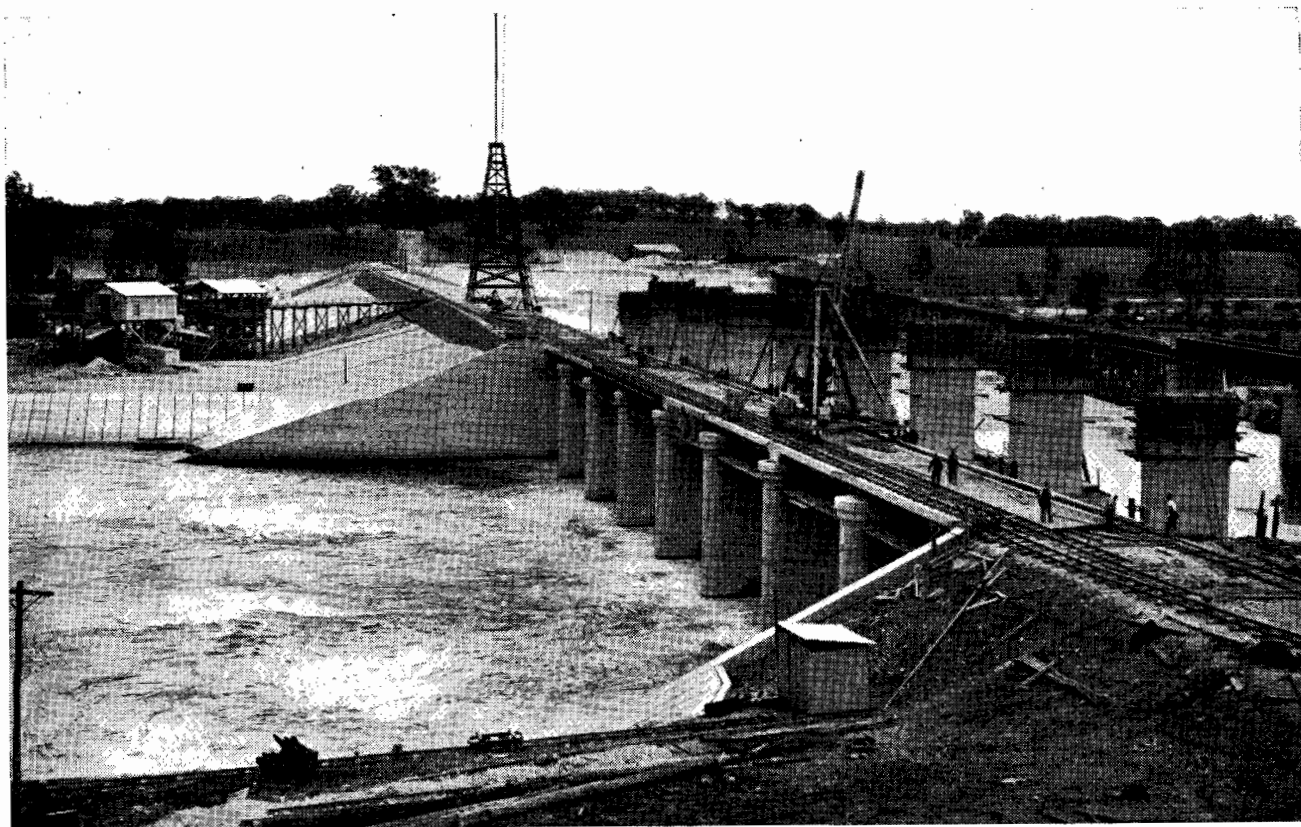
View of Yarrawonga Weir stock bridge in course of construction.
